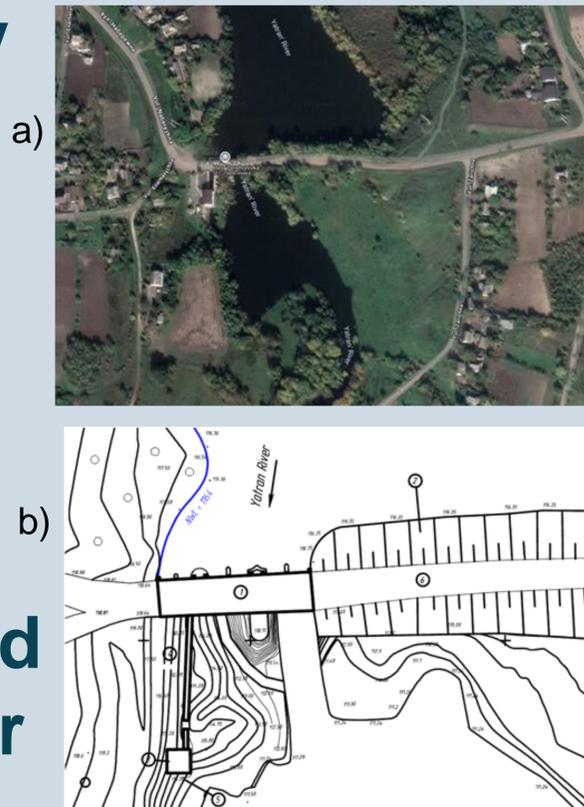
Perekhonivka mini hydropower plant: a) photo from the air, b) design of structures composition:
